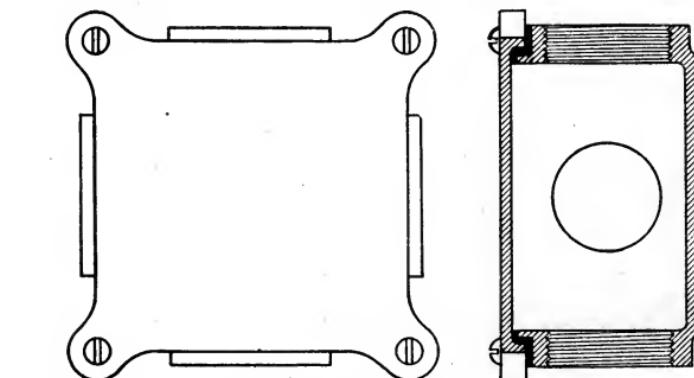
Universal and Knock-Out Type of Outlet Box.
